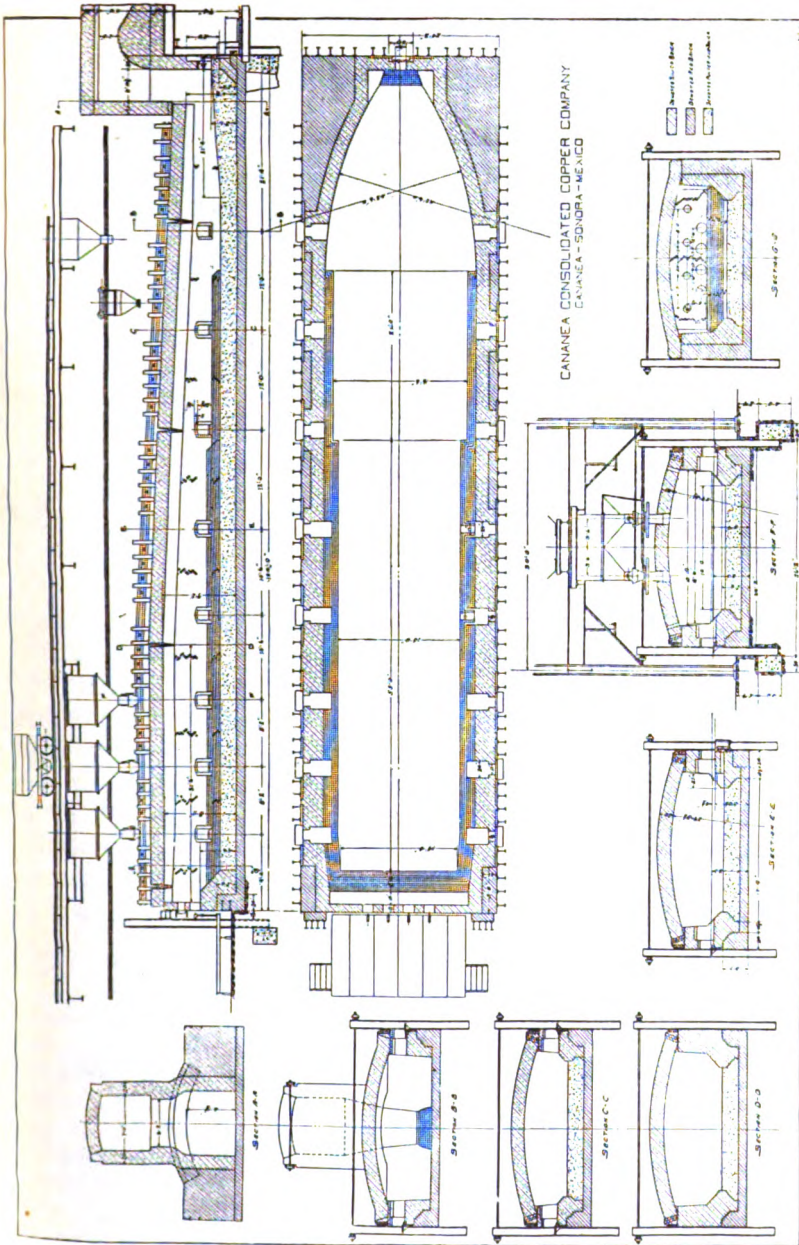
CANANEA OIL-FIRED FURNACE, PLAN AND SECTION.
